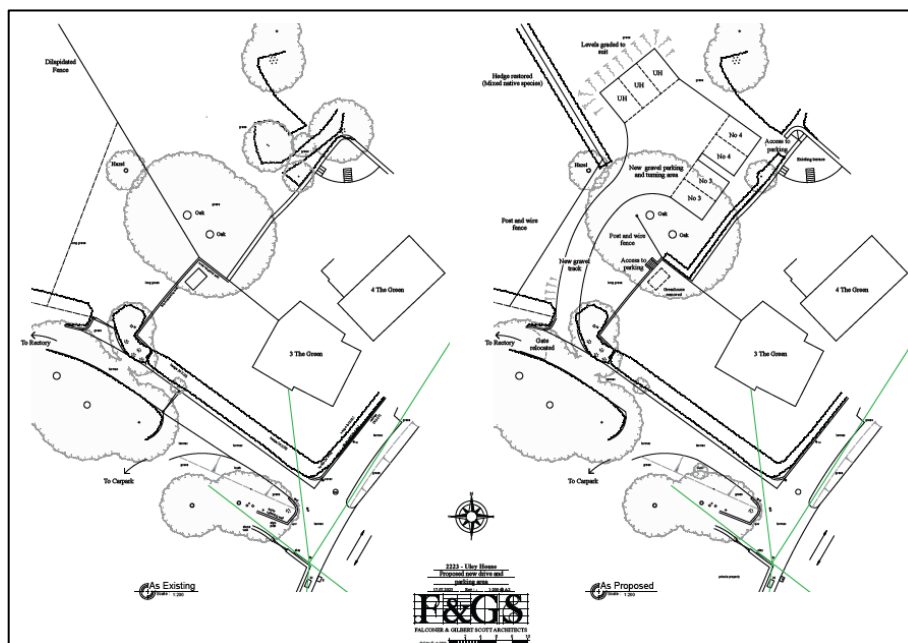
Existing (left-hand side) & Proposed (right-hand side) Site and Block Plan © FALCONER & GILBERT SCOTT ARCHITECTS
